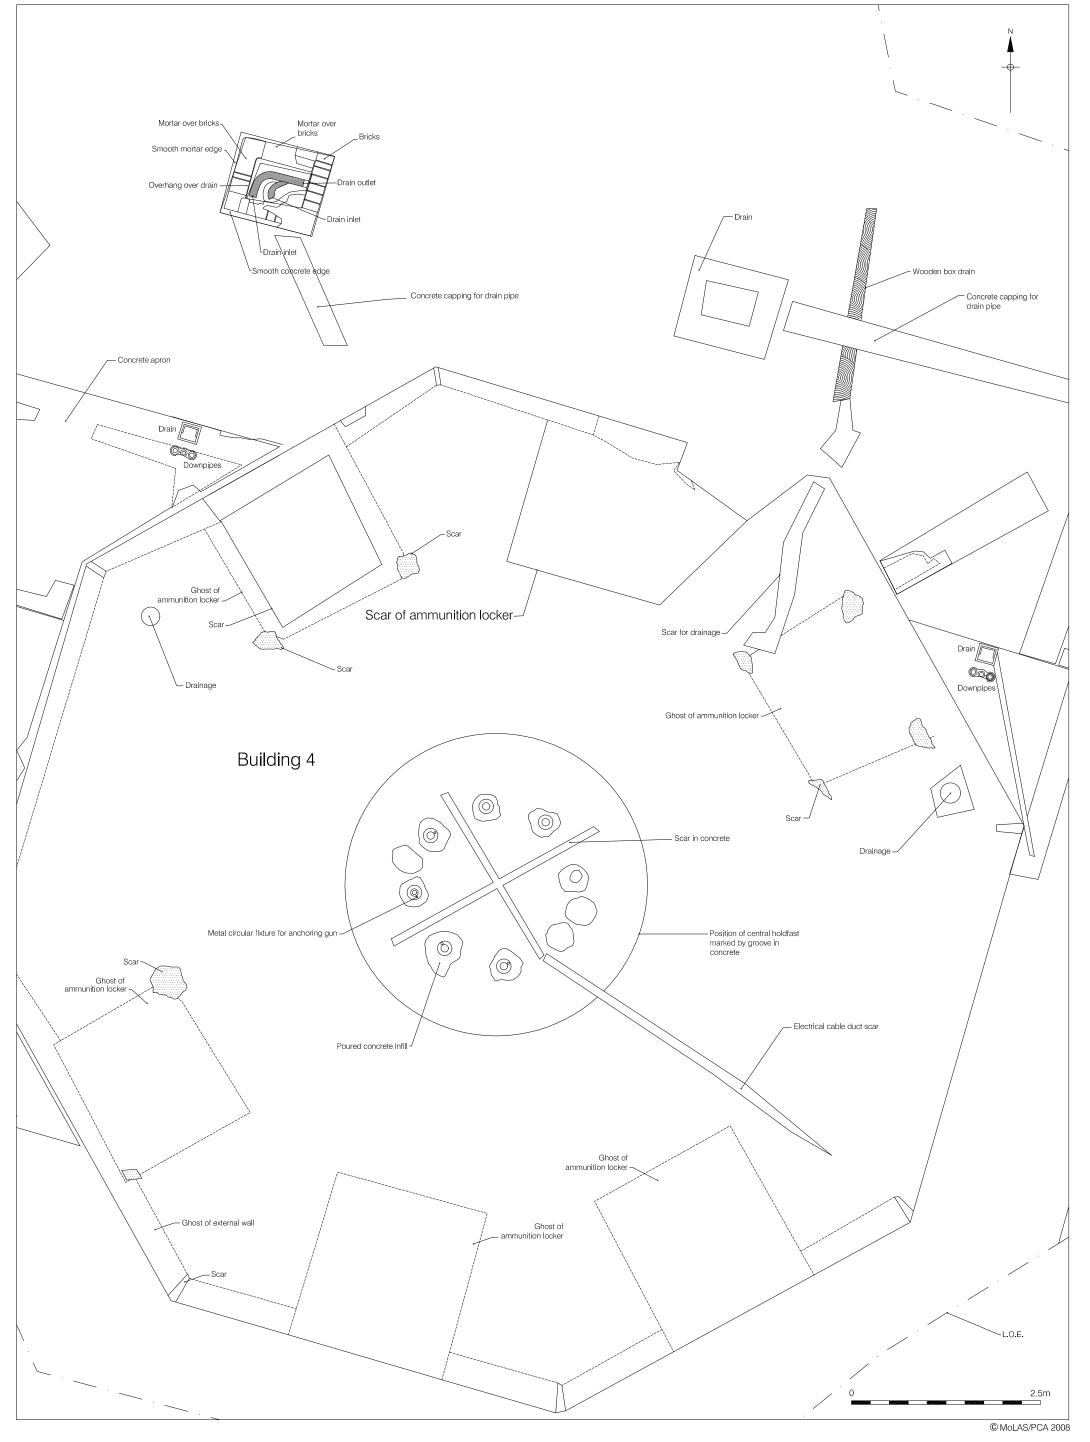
Building 4, south gun platform, plan 1:50 at A3
